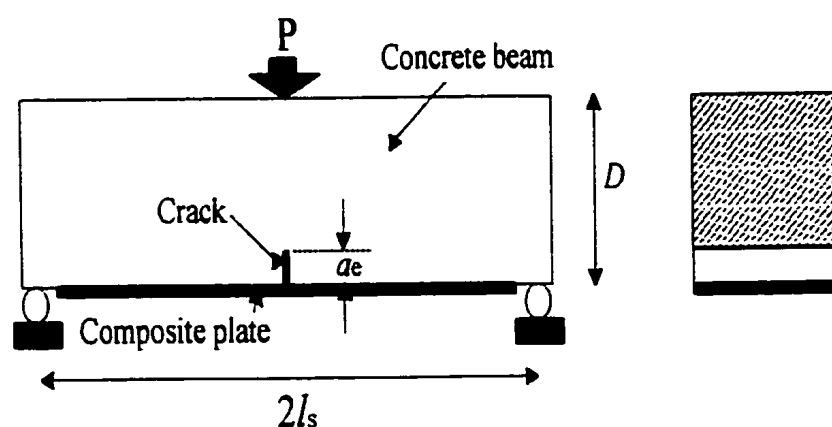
Schematic model of a rectangular cracked concrete beam strengthened by an externally bonded plate.
